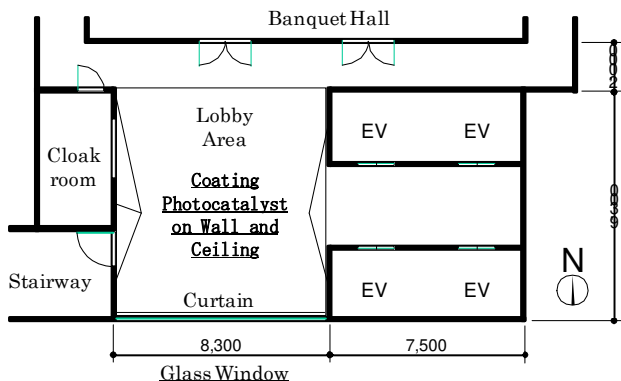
Floor Plan of 9th Floor in Municipal Complex.
